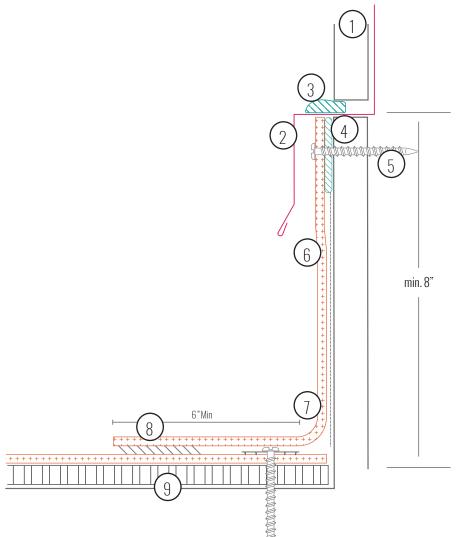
COUNTER FLASHING WALL TERMINATION
